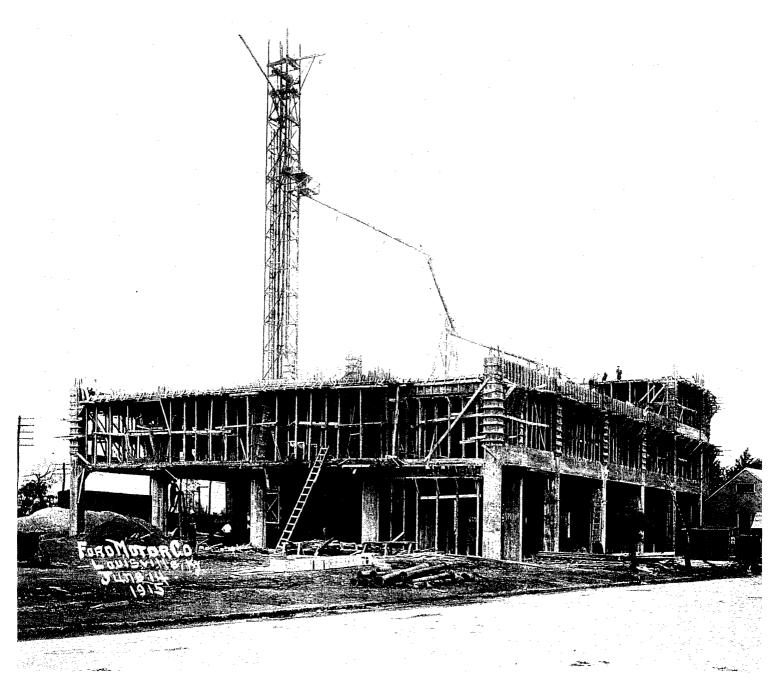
Construction photo 1915. Note single story house to the far right Ford Motor Company Archives.
